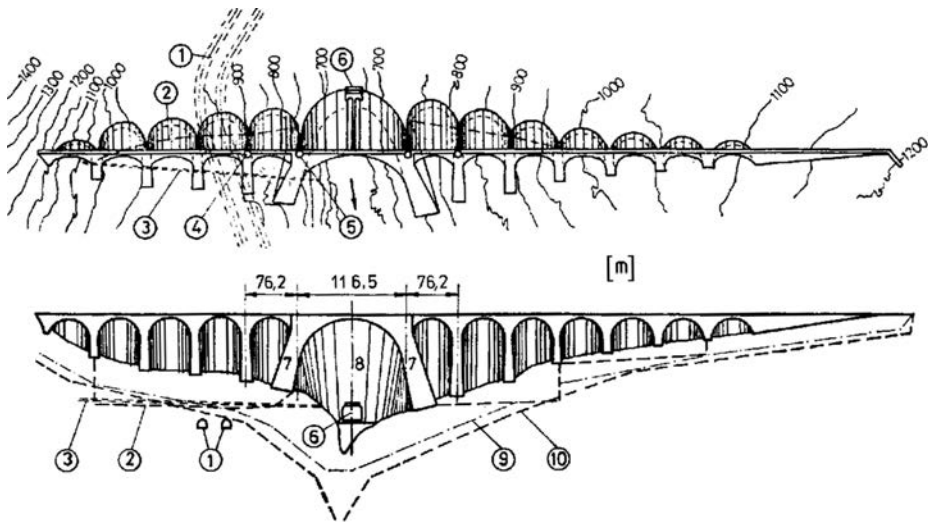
Daniel Johnson multiple-arch buttress dam (Canada). (a) Plan; (b) Elevation from the downstream face. (1) Headwater tunnels; (2) drainage gallery; (3) inspection gallery; (4) manhole for surveillance of deformations, without a lift; (5) with a lift; (6) inlet structure of the bottom outlet; (7) central buttress 25 to 40 m wide; (8) central arch with a thickness of 8 to 25 m; (9) bottom of the vertical drainage; (10) limit of the grout curtain.
